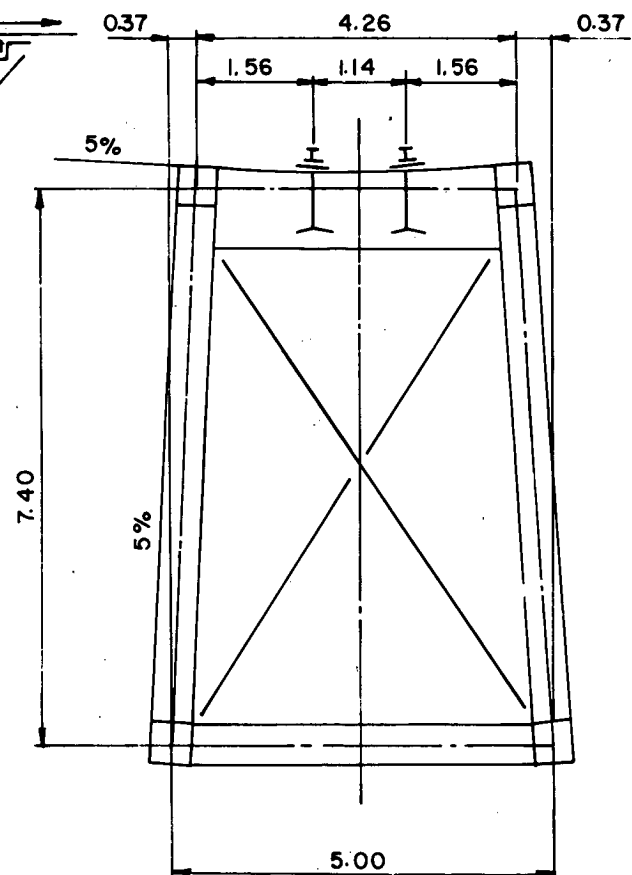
Cross-section of Ohkawa Railroad Truss Bridge.
